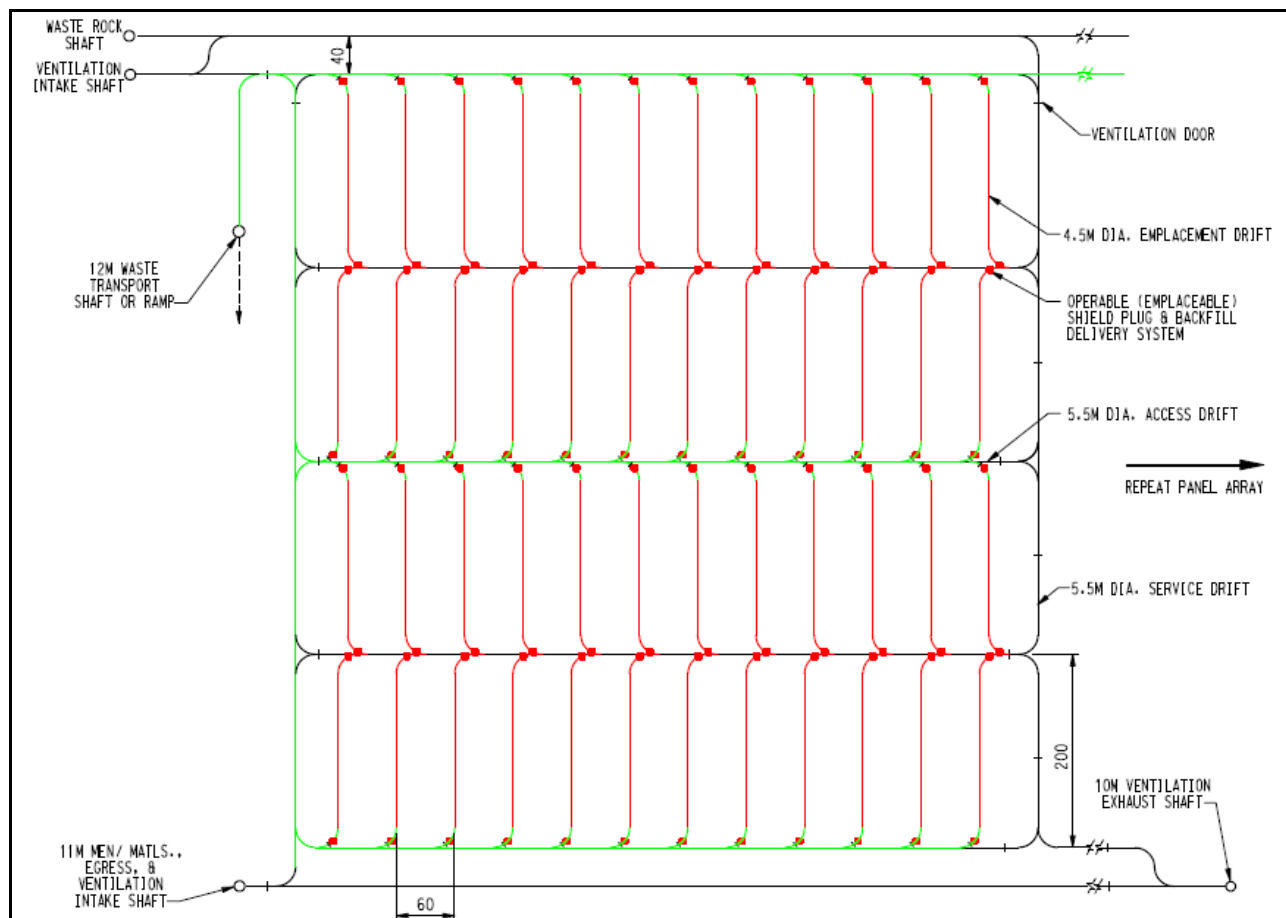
Sedimentary Backfilled Open Concept Repository Panel Layout
